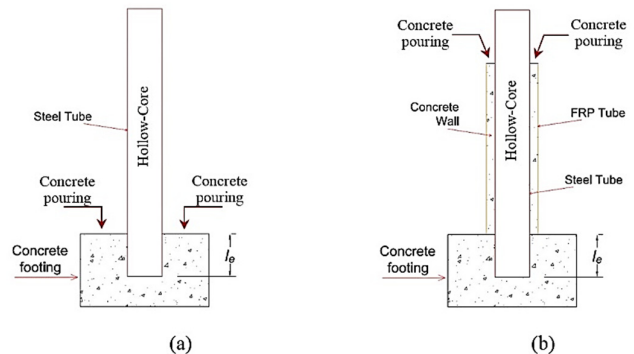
General arrangement of the construction of the HC-FCS column (a) inserting the steel tube and casting the footing, (b) installing the FRP tube and pouring the concrete shell
